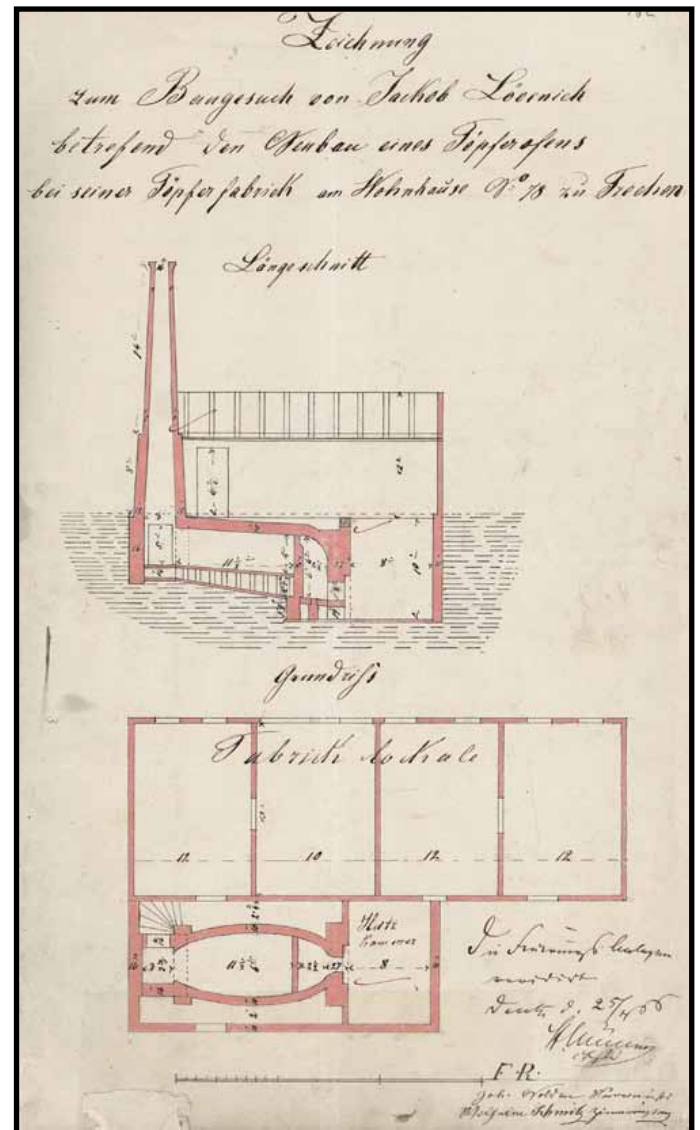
Mixed cross-draught / down-draught earthenware kiln with a chimney and horizontal grate of bricks or iron, a vertical partition wall and, as a characteristic feature, a raised kiln floor on a double archway. Frechen, Nordrhein-Westfalen D, earthenware kiln of Jakob Lövenich 1866 (Stadtarchiv Frechen Akte 189, Fol. 162).
